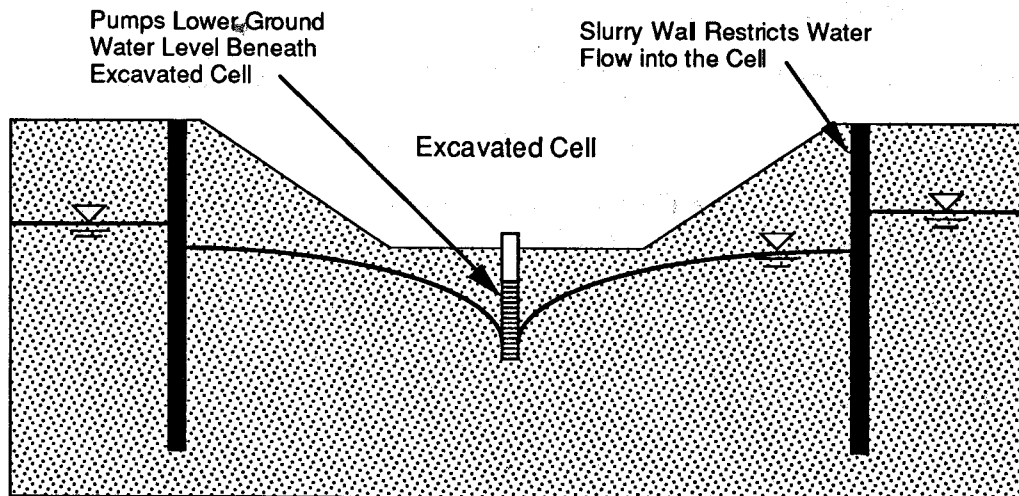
Example of Vertical Cutoff Wall to Limit Flow of Ground Water into Excavation.
